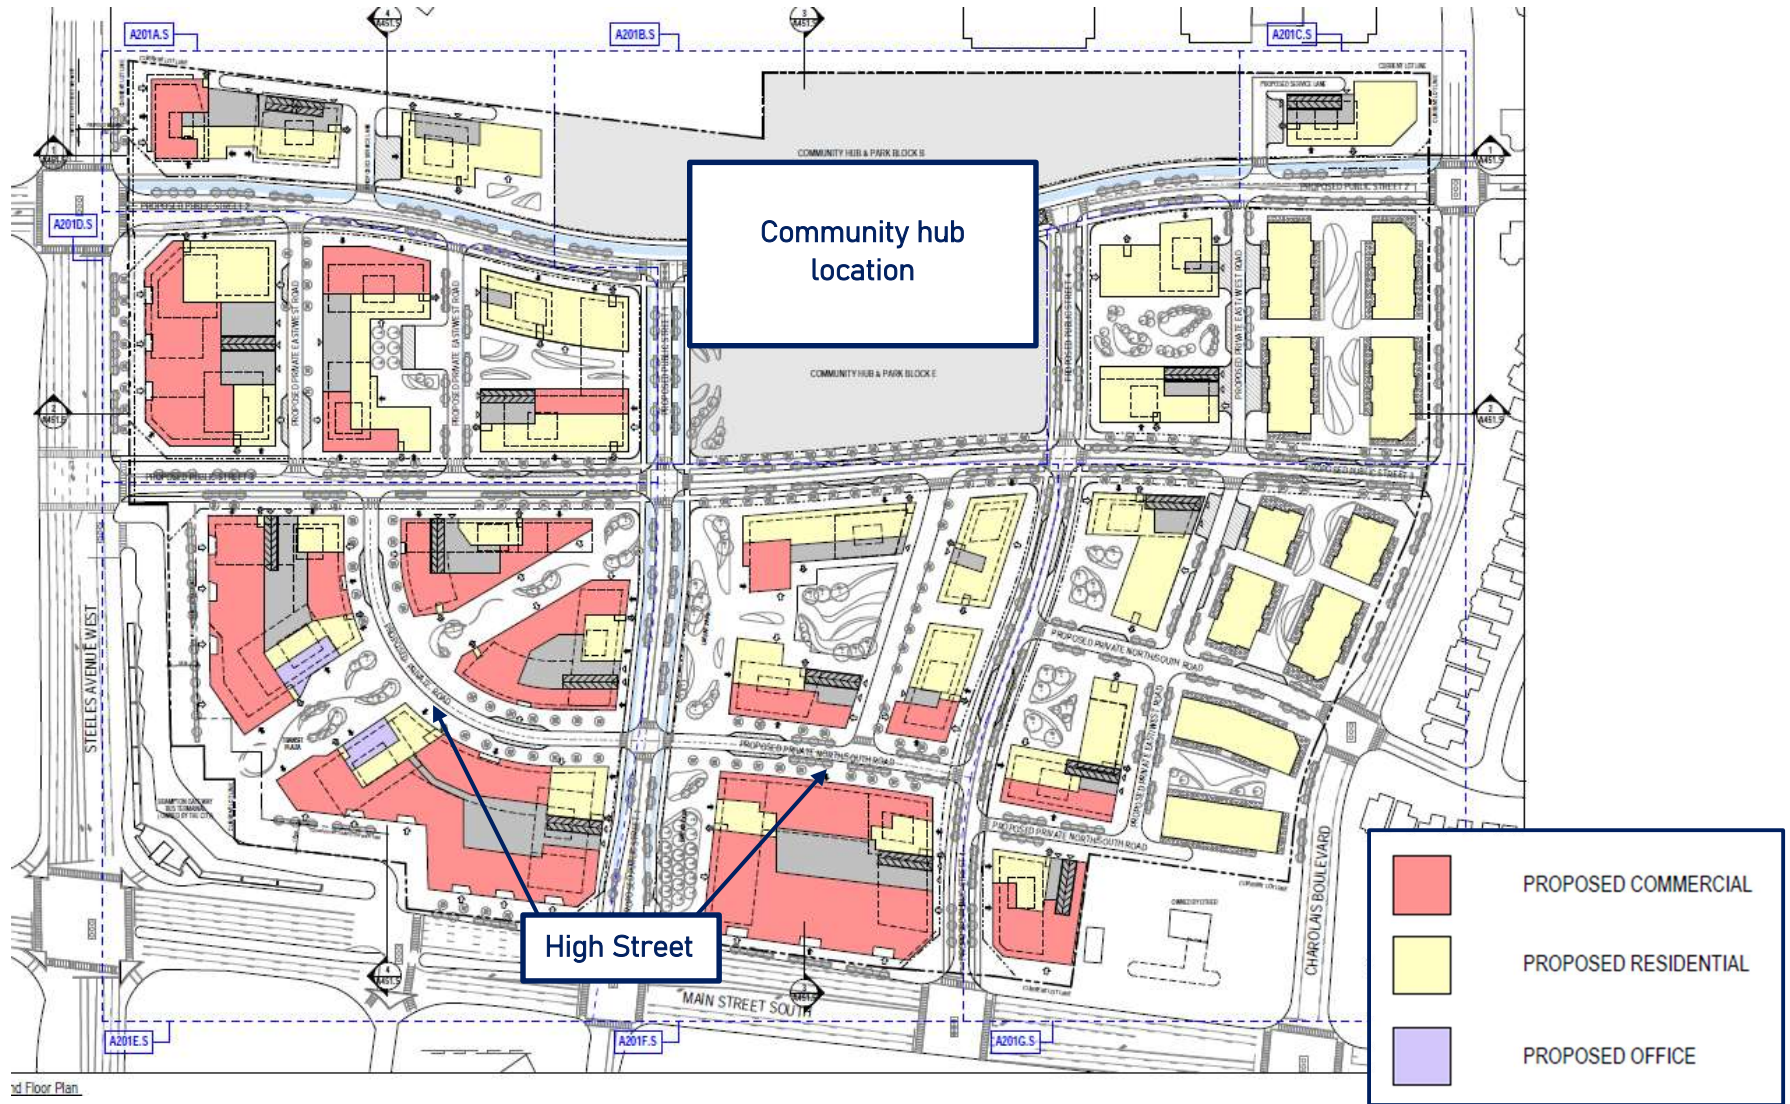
Ground Floor Plan, proposed Shoppers World Mall redevelopment
